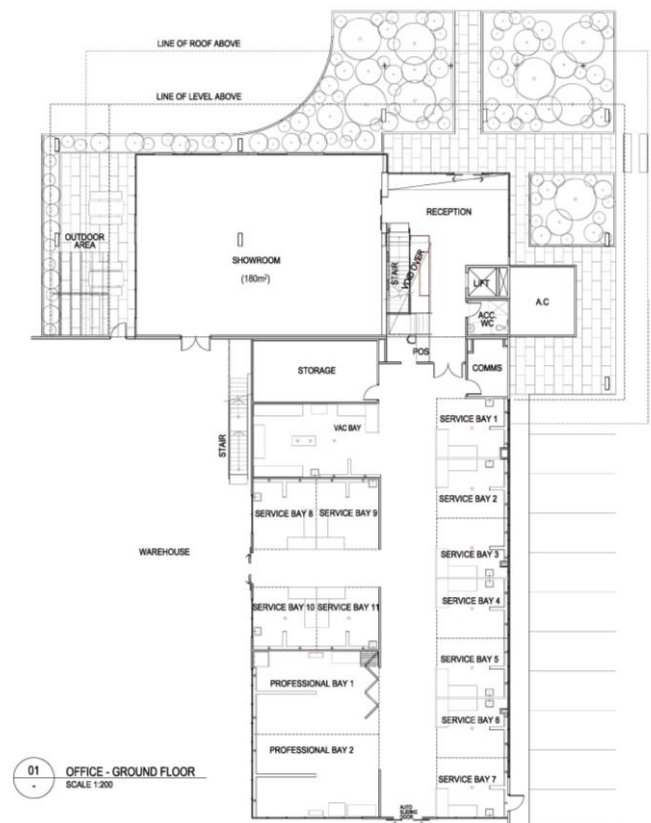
Proposed Ground Floor Industry and Showroom Areas
